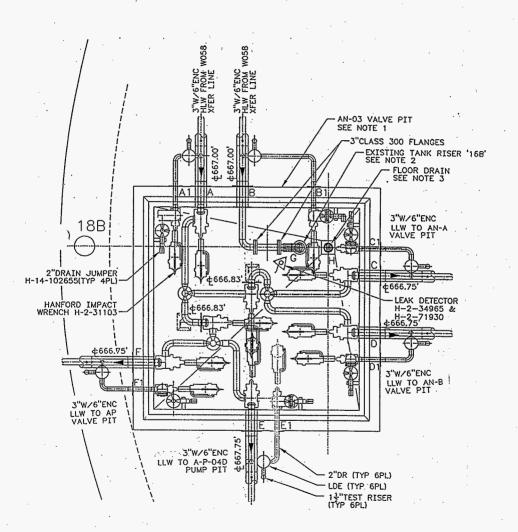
Proposed 241-AN-103 Valve Pit Layout.
